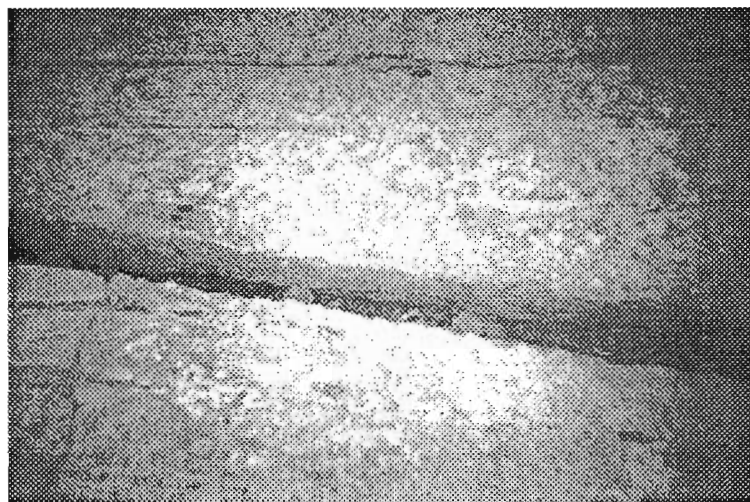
Pavement Cracks Wider than 7 mm can Trap Bicycle Tires
